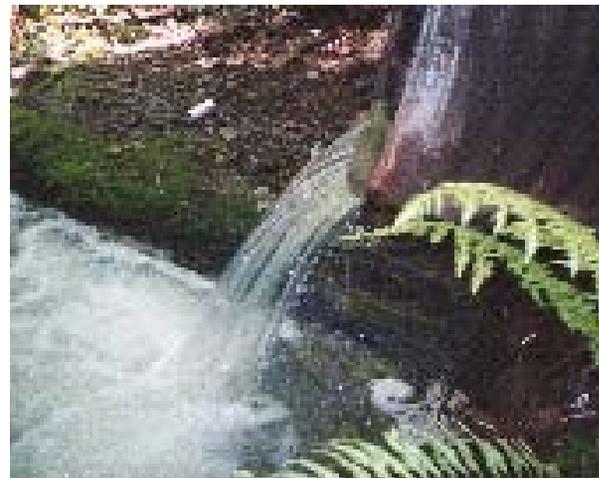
Mitchell Creek culvert as seen from east side of 162nd Street
